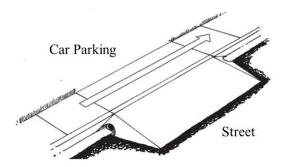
Driveway Crossing with Good Design (Kirschbaum, et al., 2001, p. 5-4)
